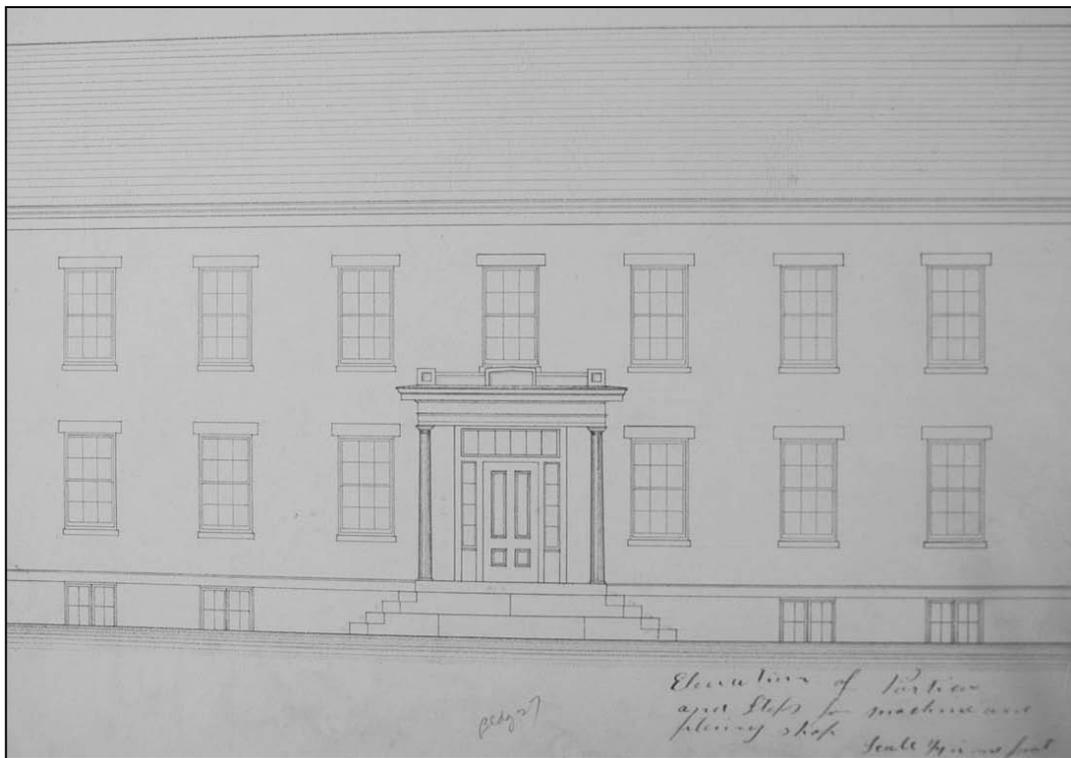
"Elevation of Portico and Steps for machine and filing shop, March (3), 1879." Portico and steps designed for the south elevation entrances of Building 27.
